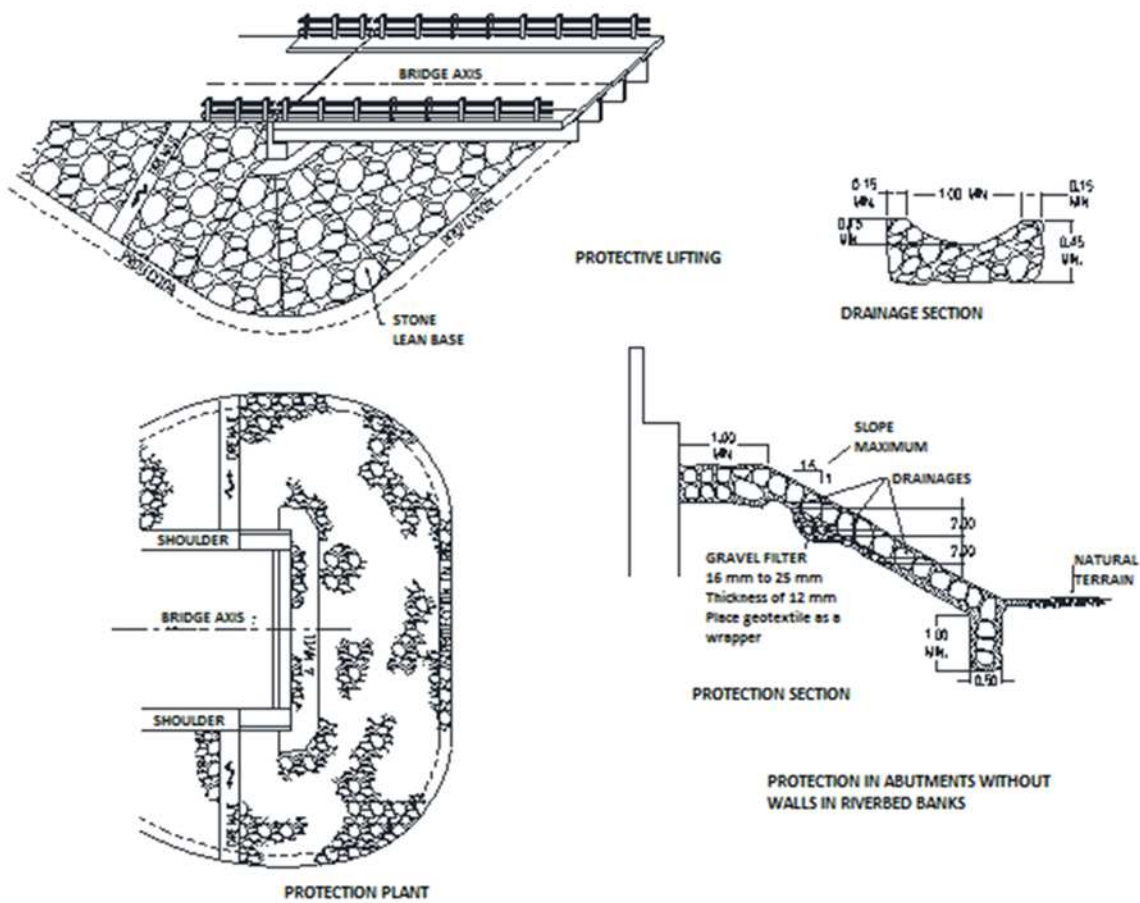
Abutments protection without walls on the banks of the river with stone lean concrete base. (SPOP, 2014)
